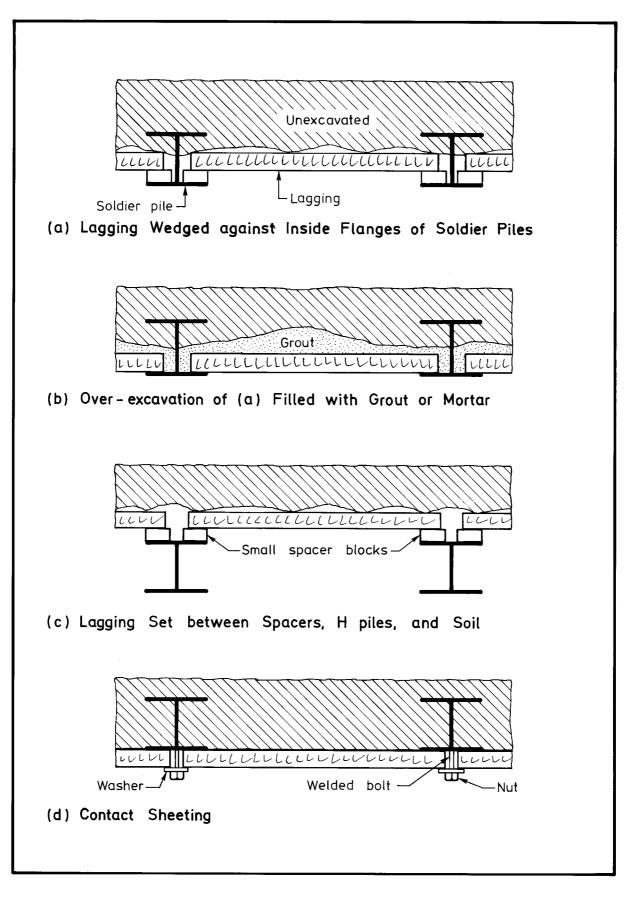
Methods for Transferring Earth Pressure from Lagging to Soldier Piles (Peck, 1969b)
